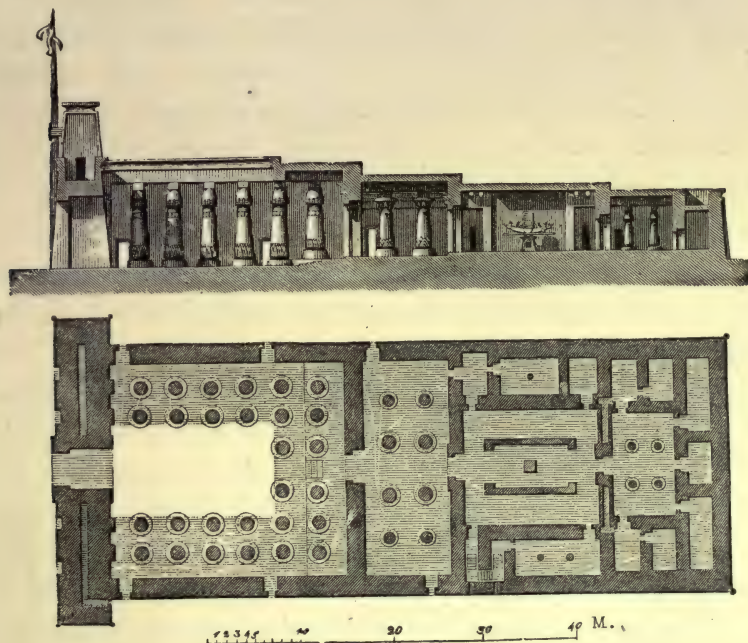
Longitudinal Section and Ground-plan of the Temple of Chensu at Karnak.
